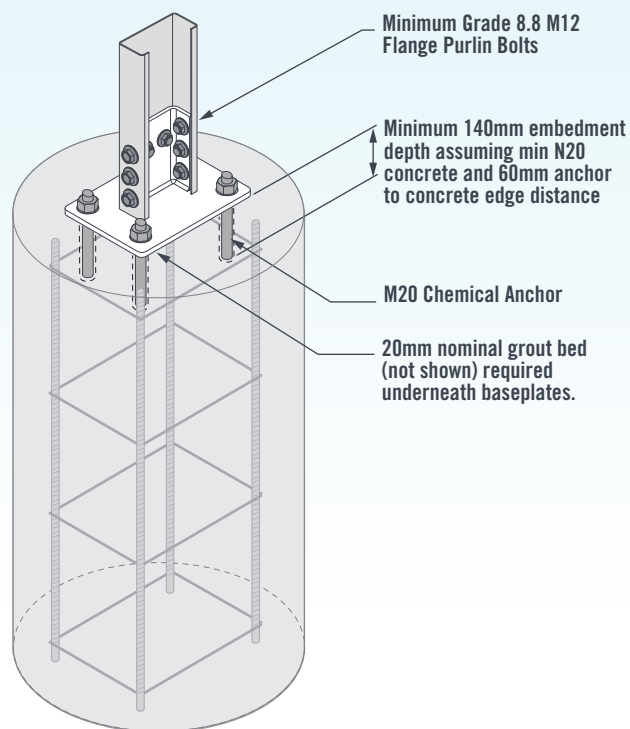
INTERNAL COLUMN WITHOUT SLAB
